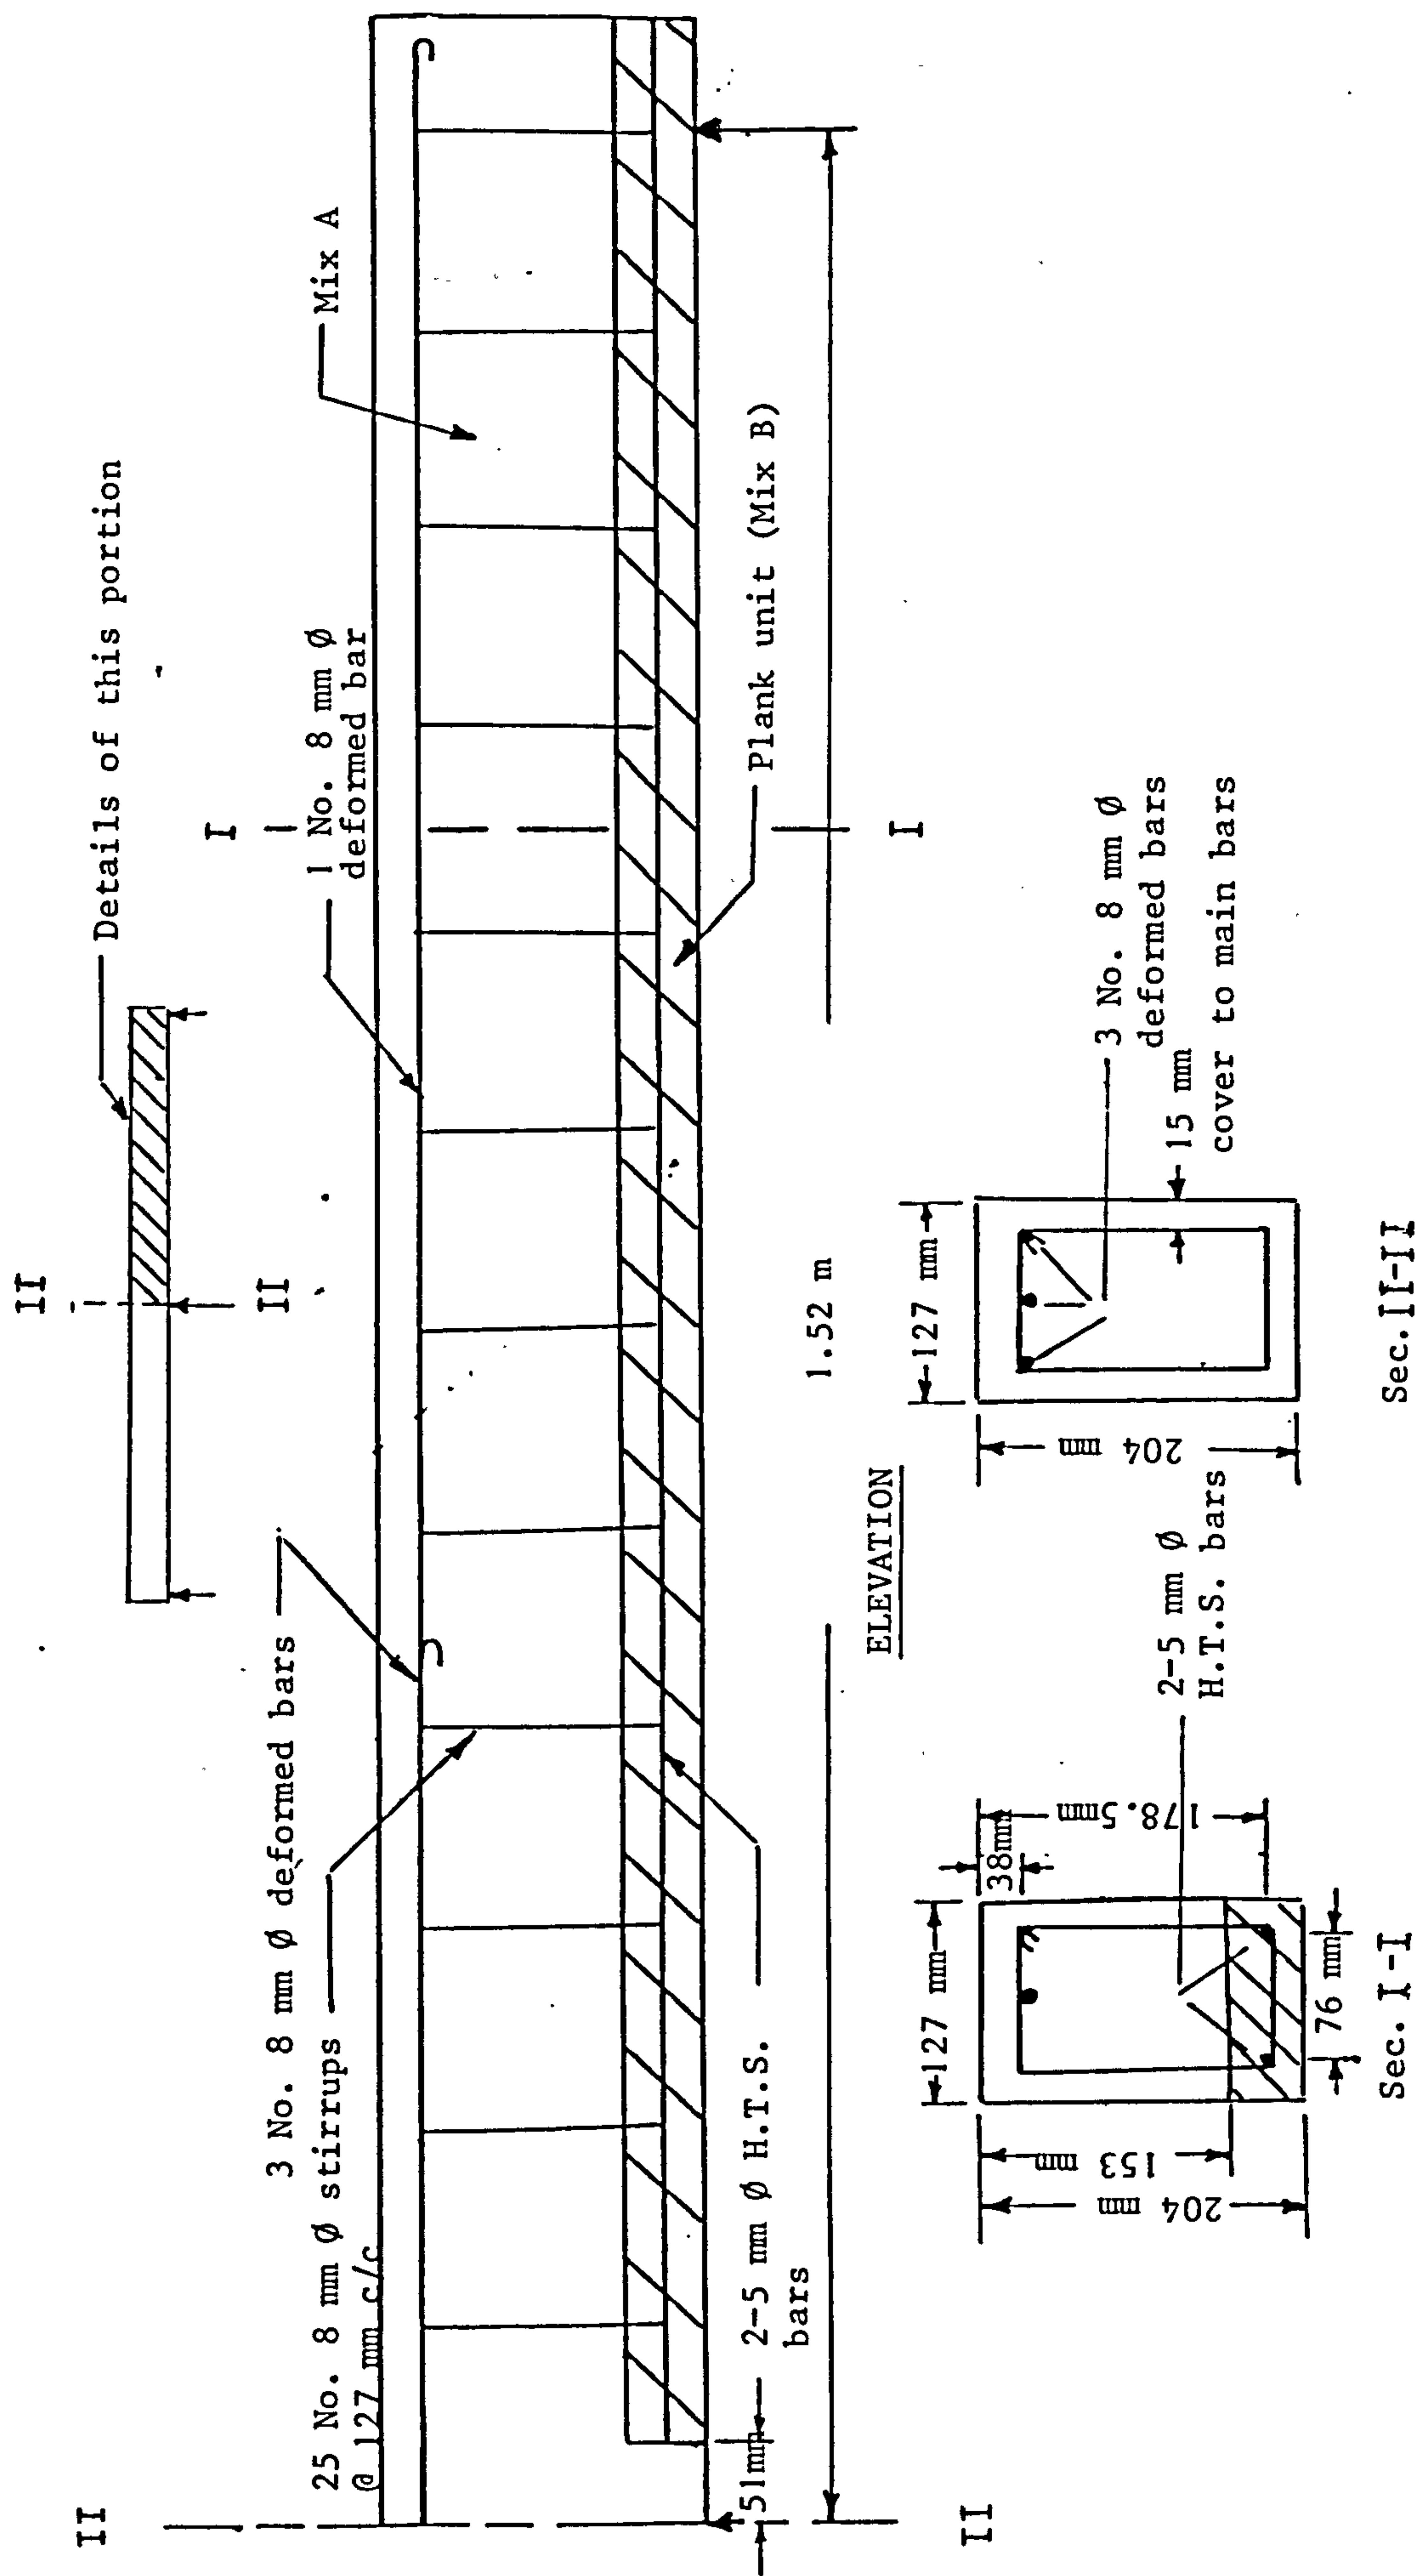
Diagram showing reinforcement in composite prestressed concrete continuous beam
